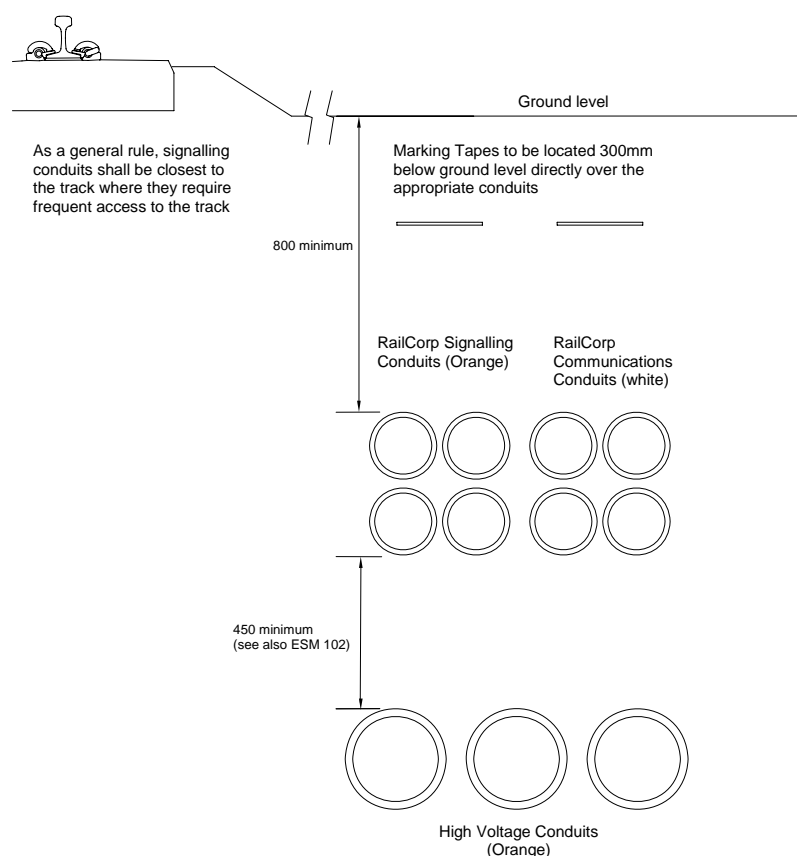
Arrangement of Conduits in Shared Services Route – Sharing with vertically separated HV power conduits
